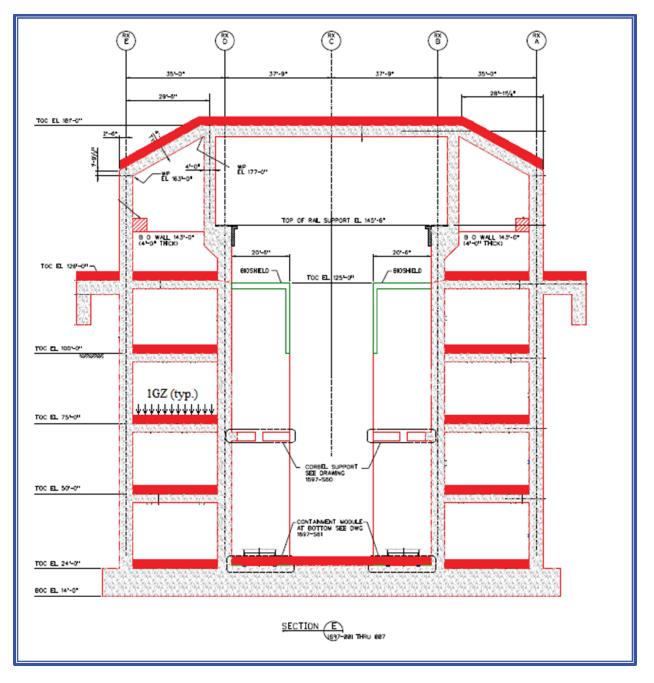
RXB Elevation View Showing Gravity Loading (in red).
